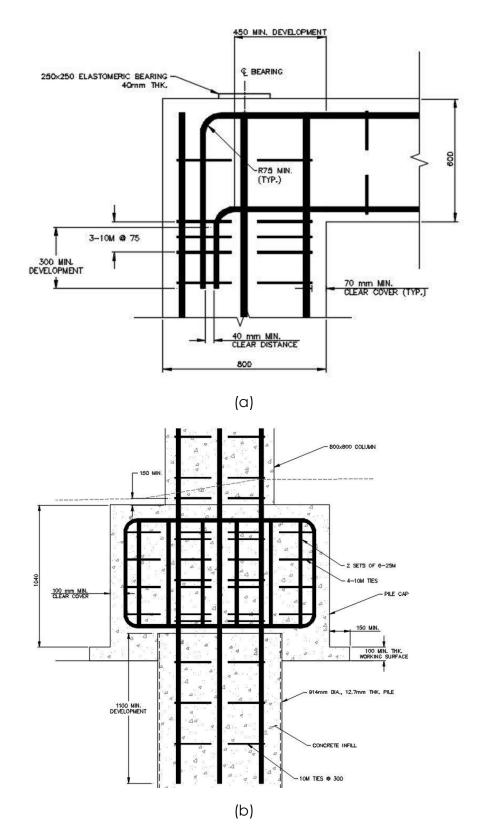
Connection Details: (a) Beam-to-Column; (b) Pilecap
